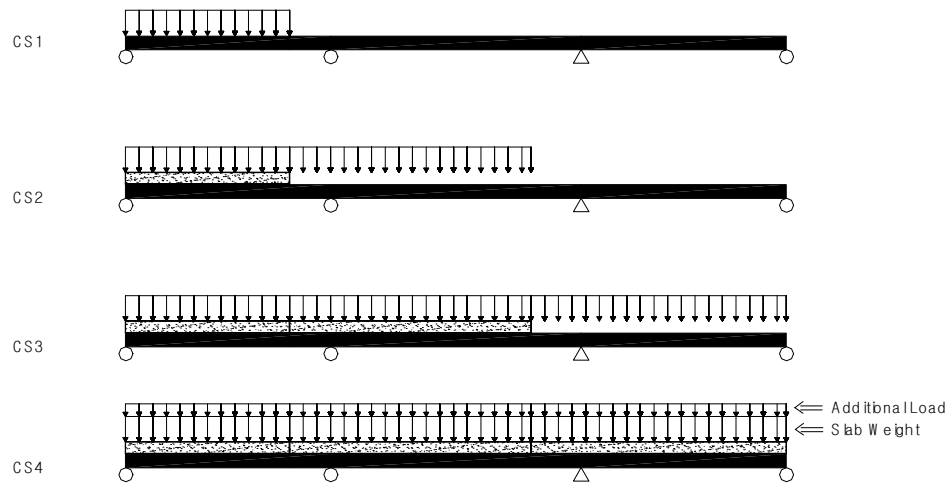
Slab weight and additional dead loads loaded at each construction stage
